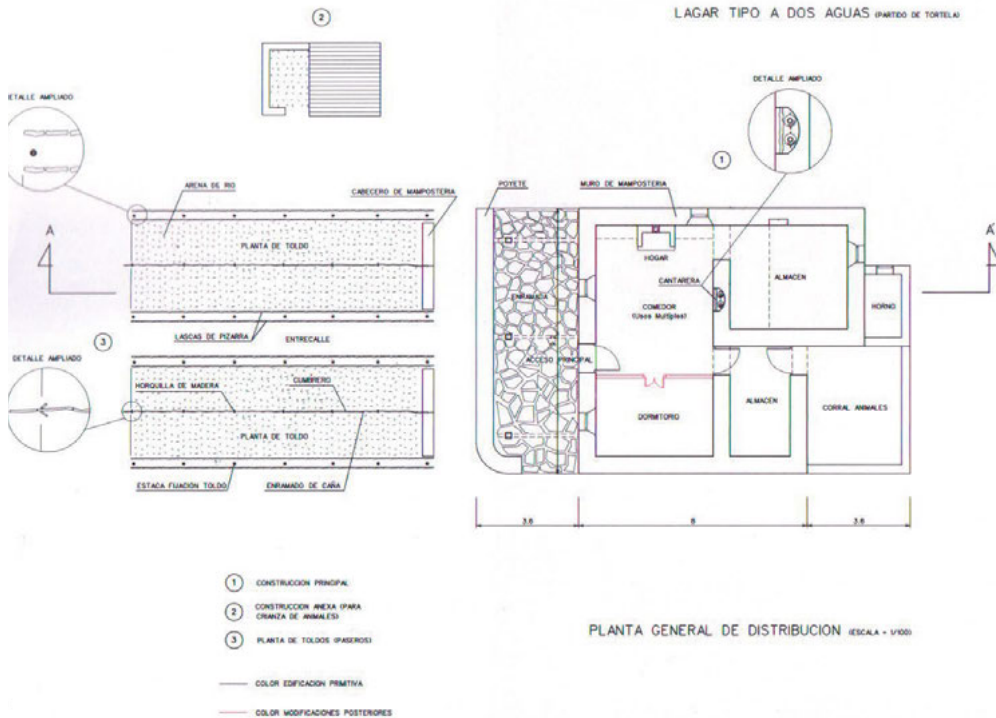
Typical layout of a gable-roof *Lagar*. (Source: Gámez, J. 2004).
